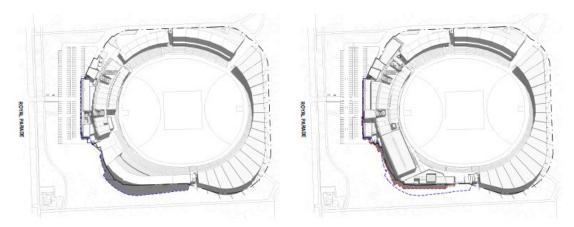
Existing and proposed shadows at 12.00 noon at equinox (source: application plans prepared by Populous)
